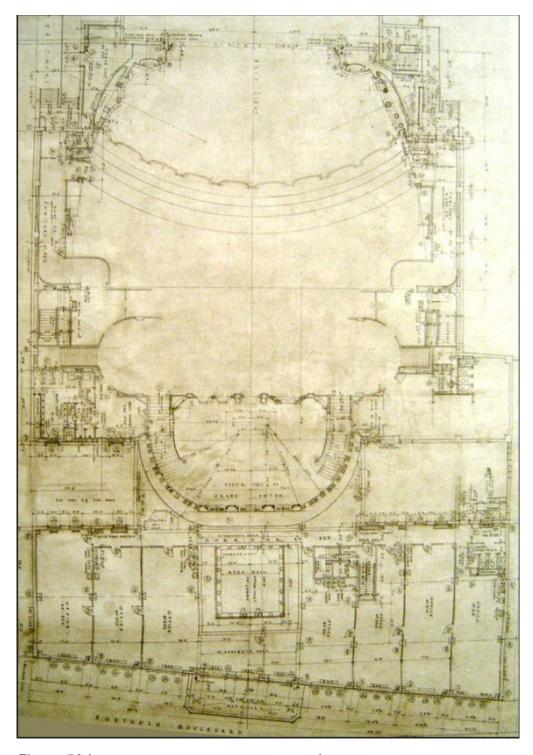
| Level One Floor Plan , photo credit | Michael Perlman
